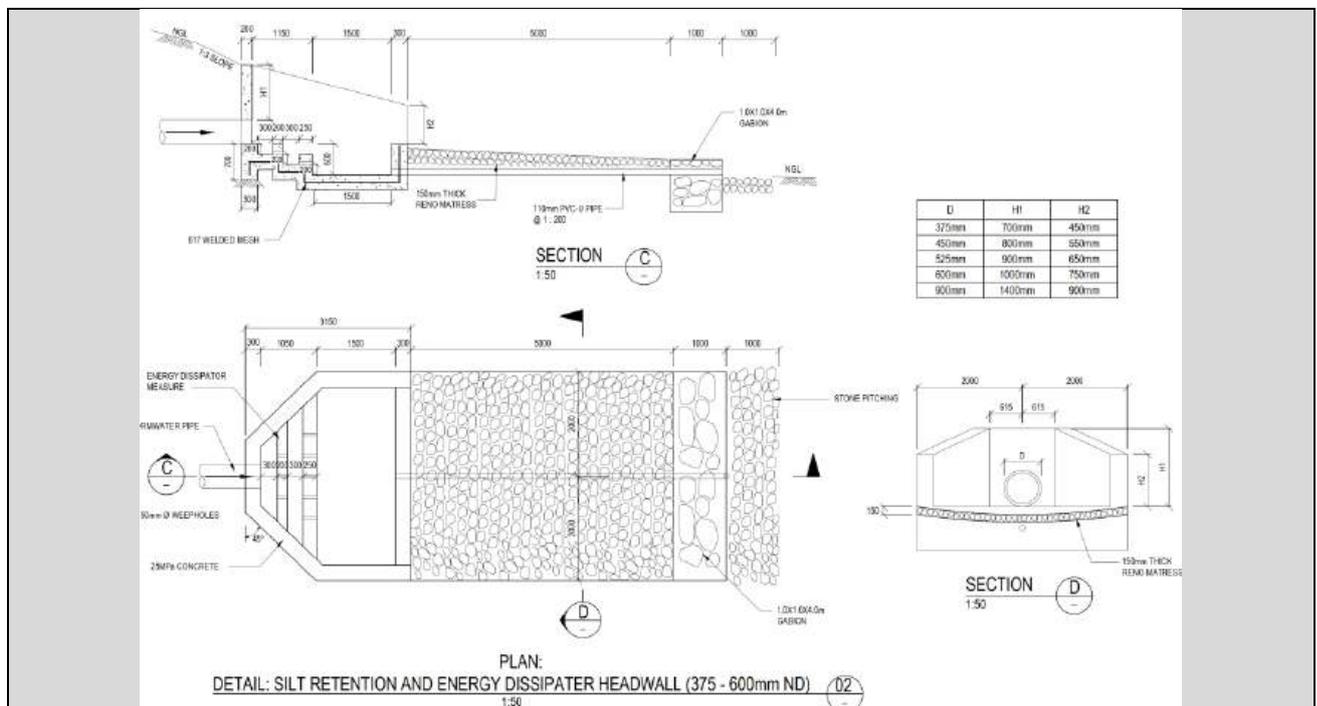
Example of a silt retention and energy dissipating headwall at stormwater outlets.
